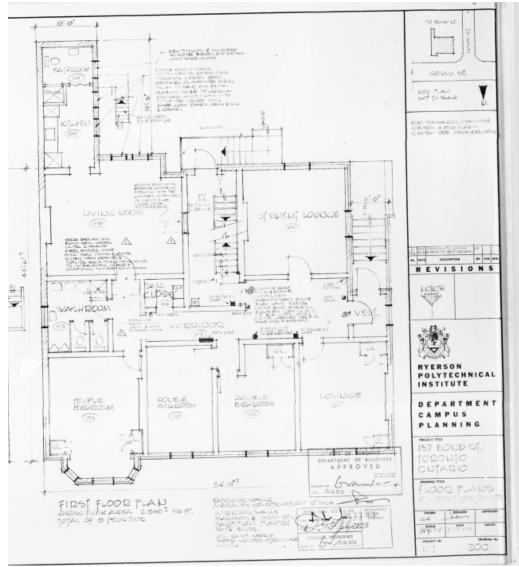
Building Records, Toronto and East York, Building Records File No. 039633 (1973). 137 Bond Street, First Floor Plan.
